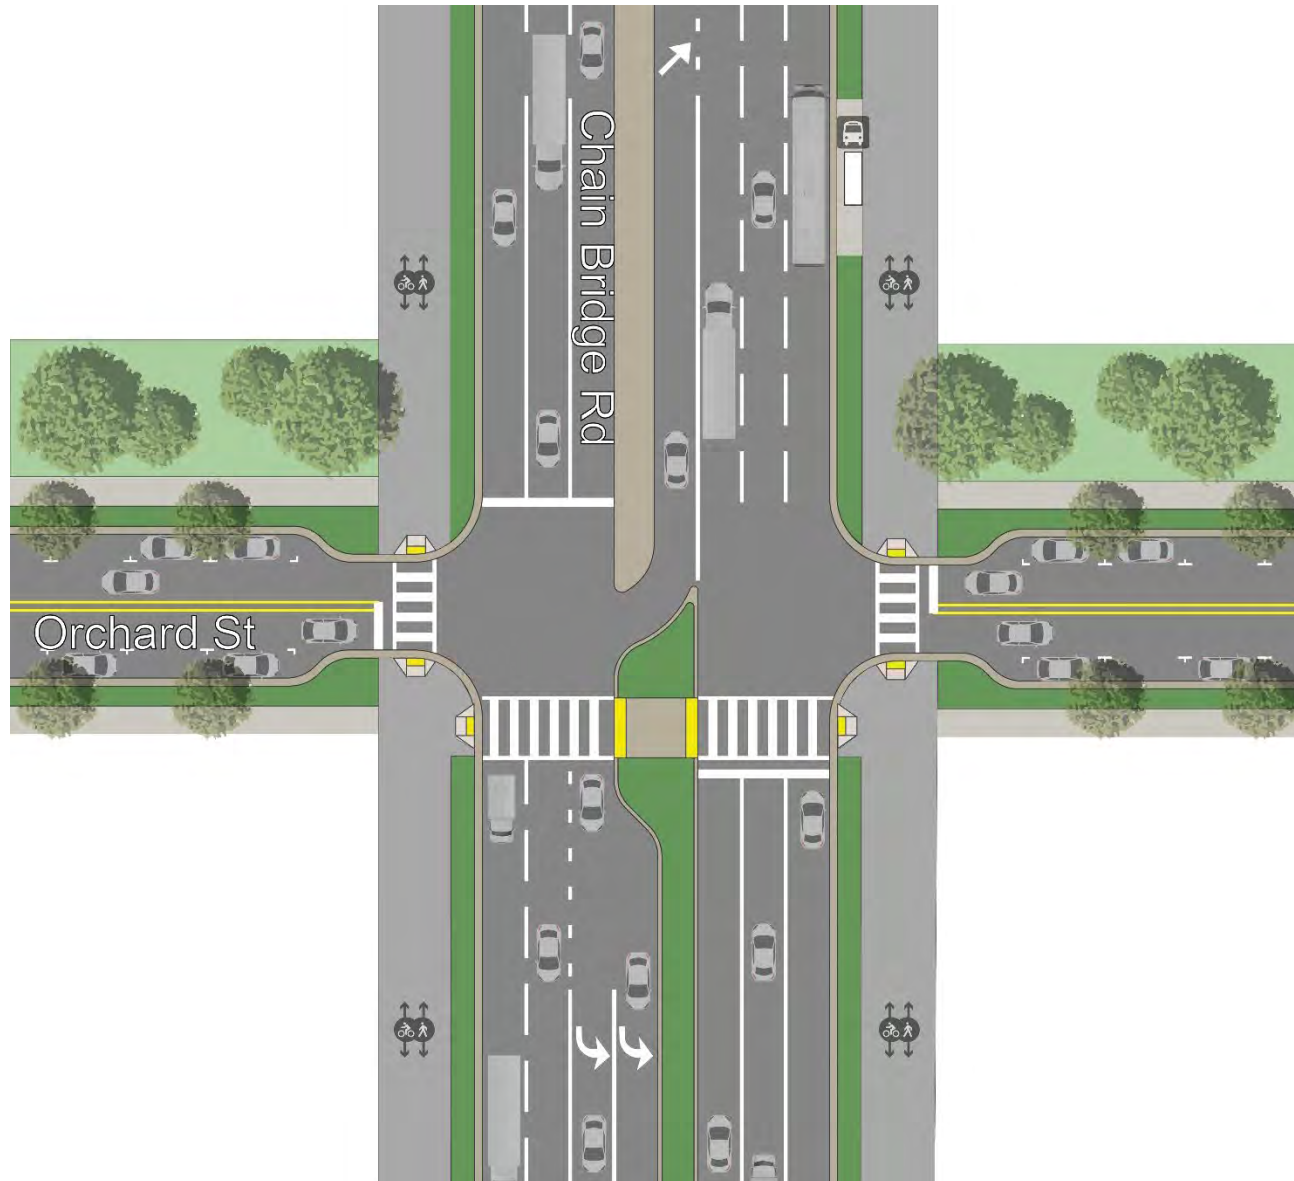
Proposed Orchard Street/Chain Bridge Road intersection configuration
